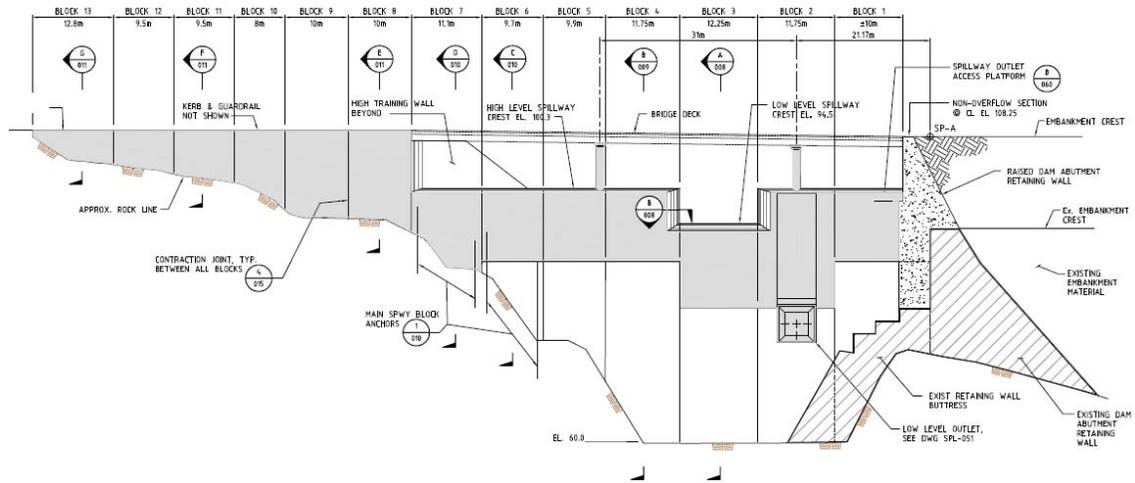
Upstream Elevation of Stage 3 Spillway Raise
